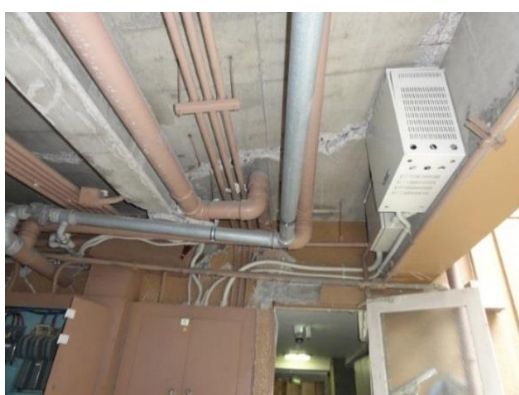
Damage to first floor diaphragm at wall (similar damage not apparent on other levels).
